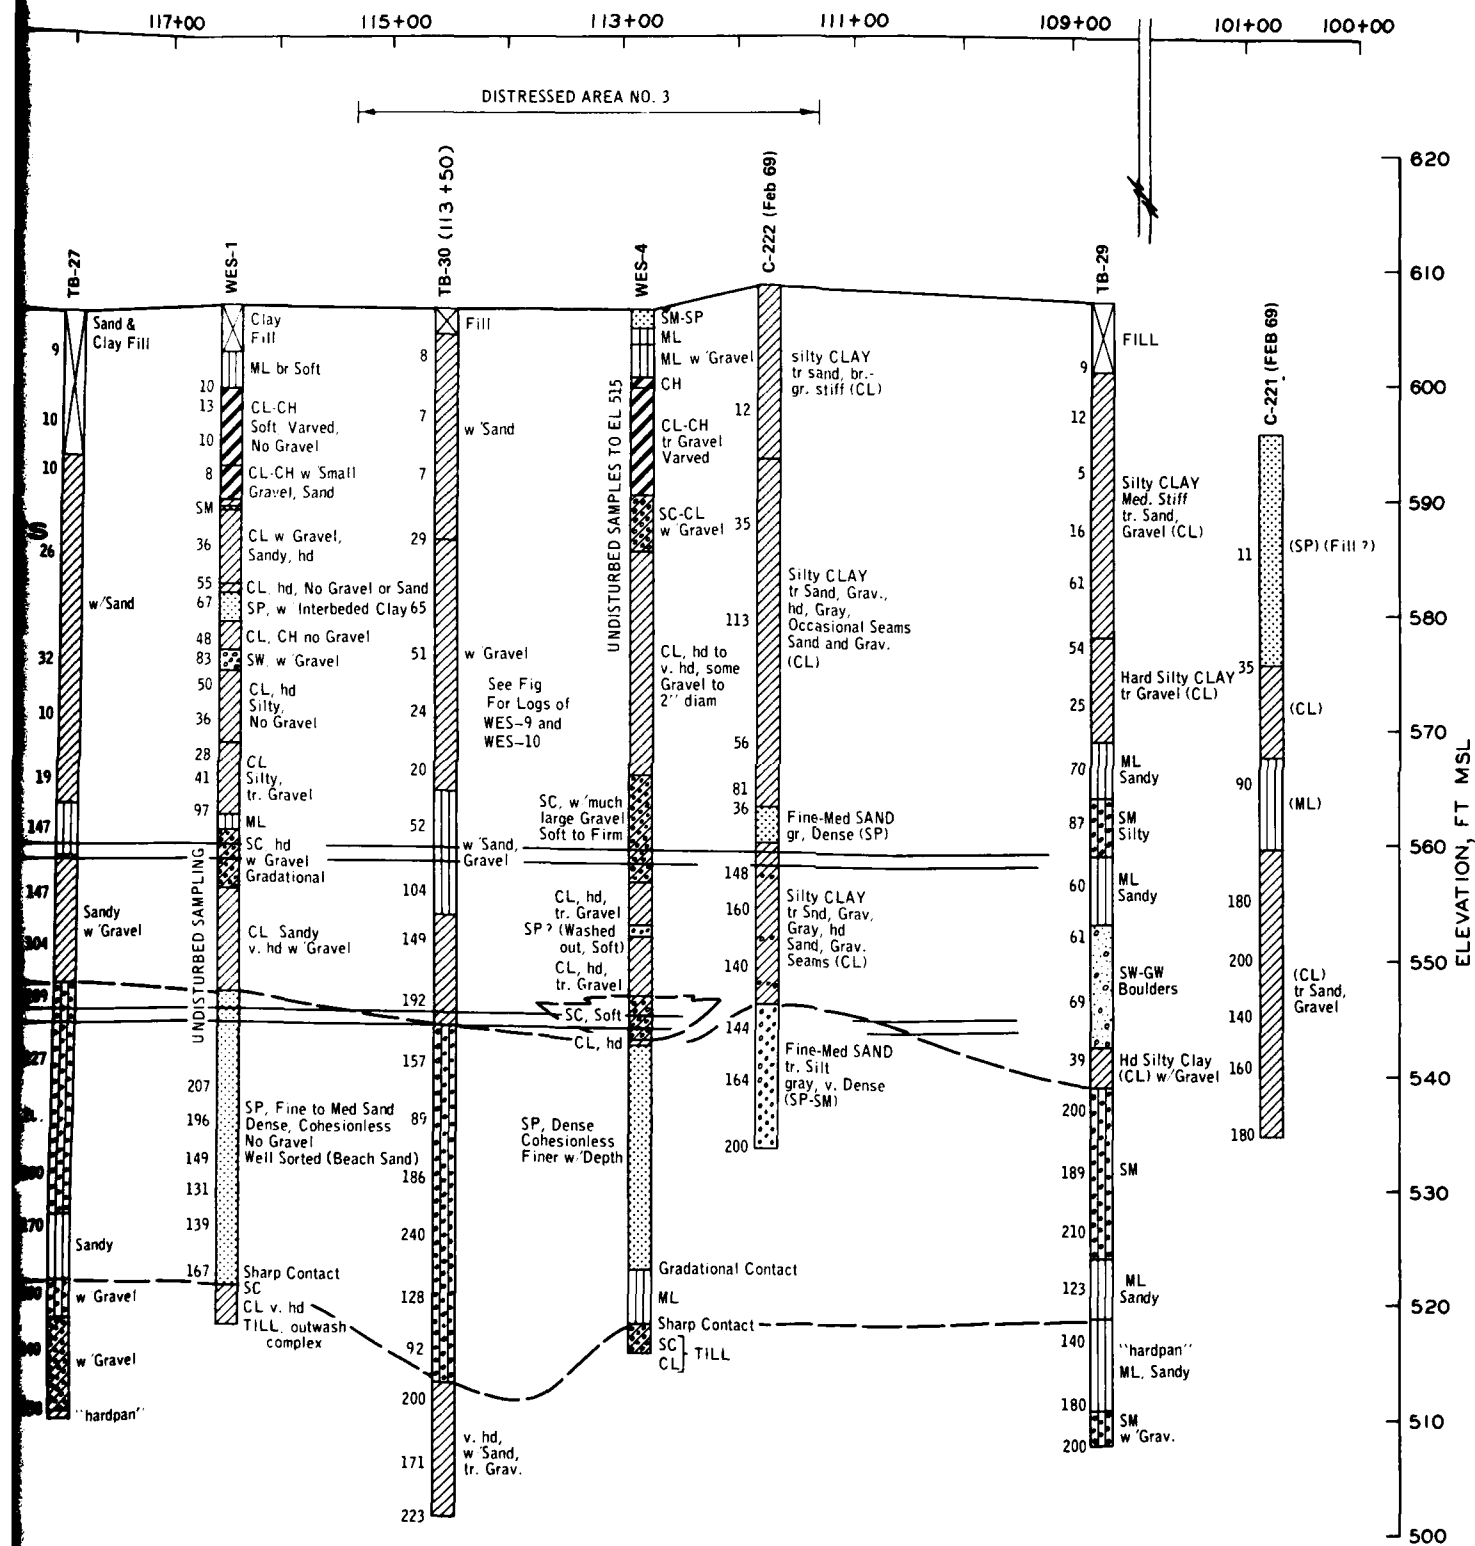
Detailed stratigraphic profile, 15 Mile Road/Edison Corridor Tunnel Failure Study
